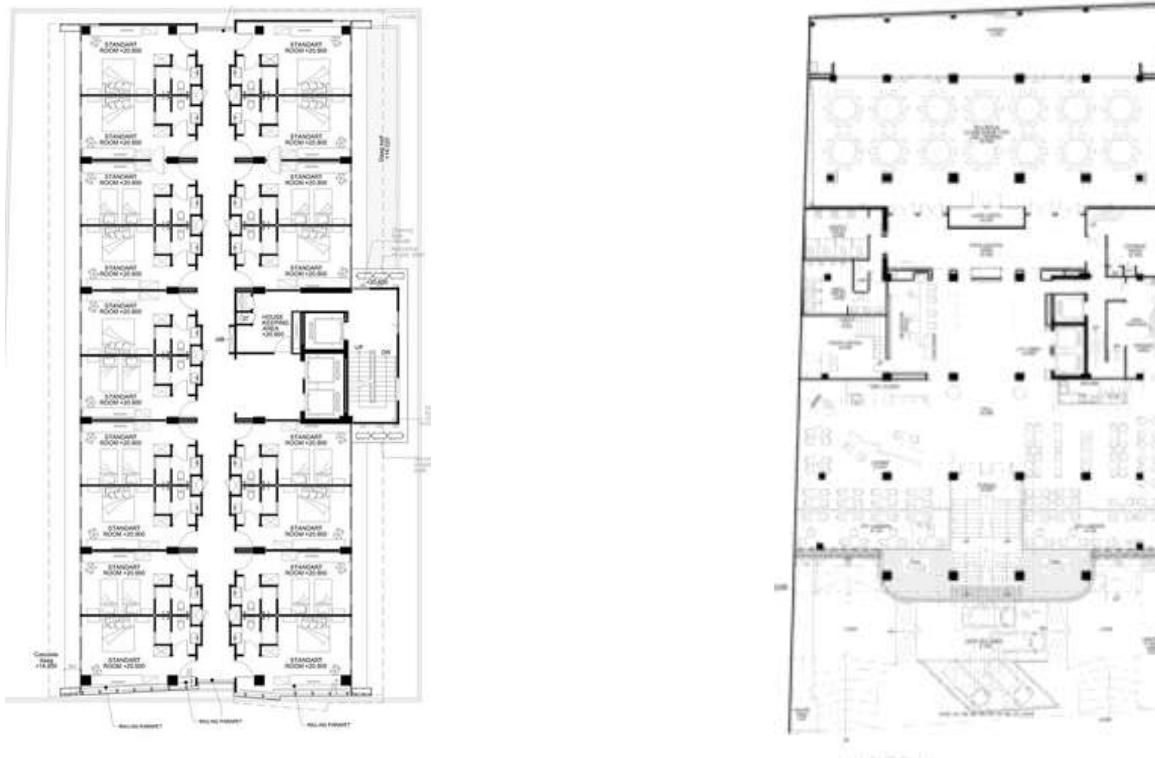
2nd - 8th floor plan and 1st floor plan of Akmani hotel
